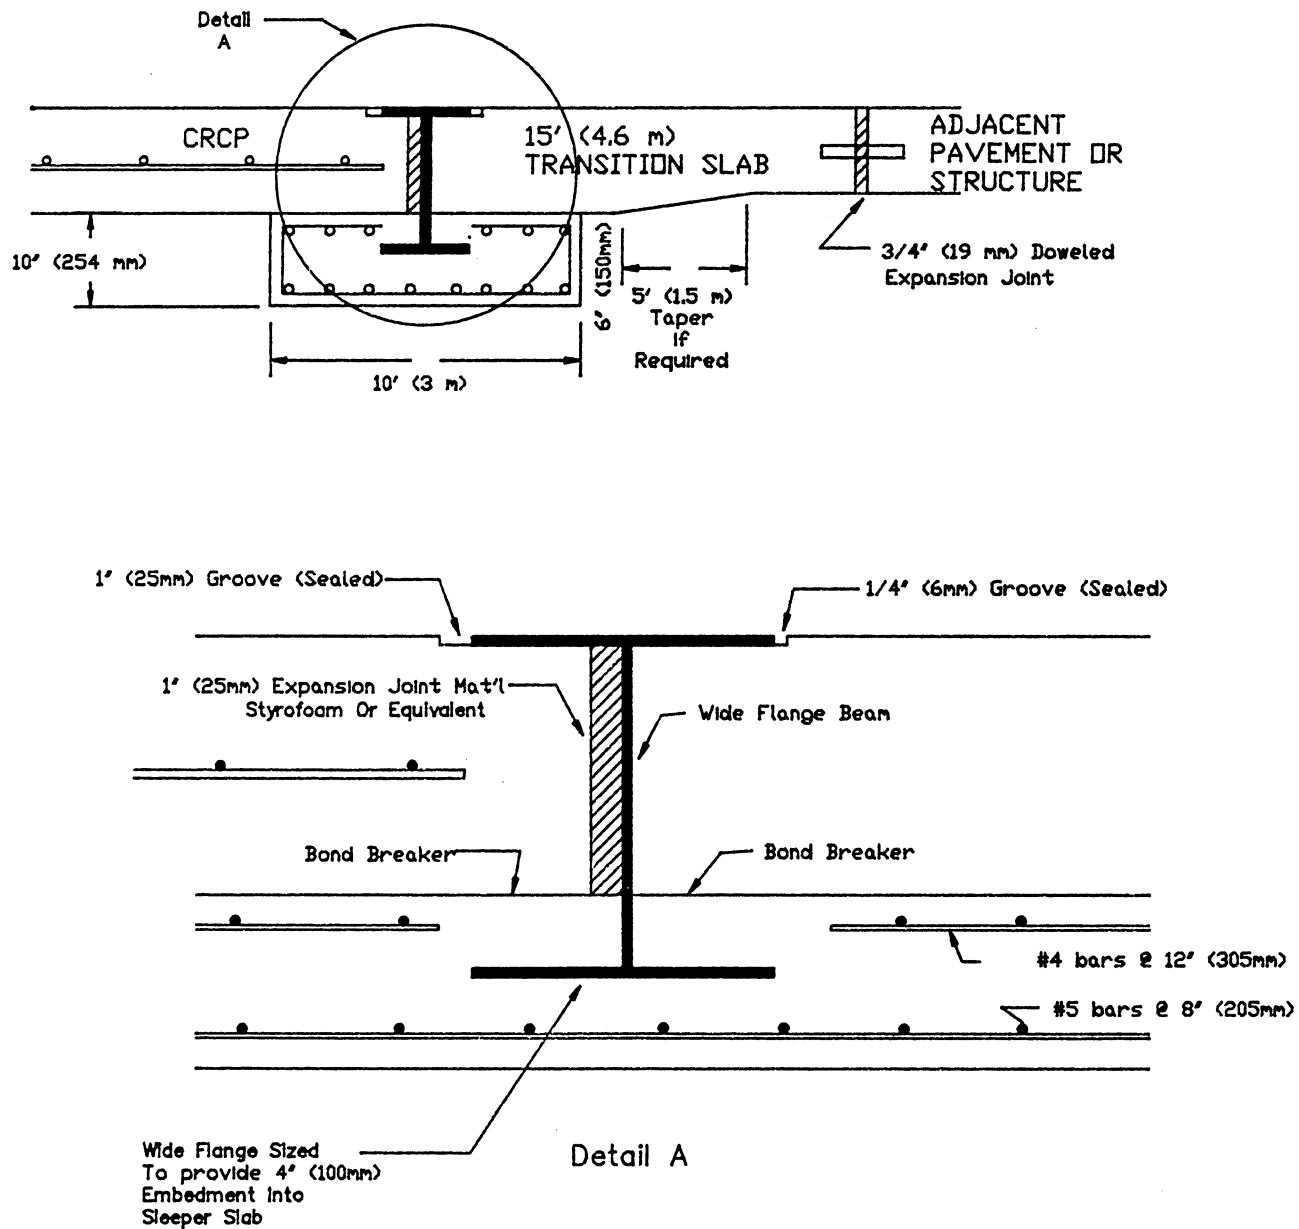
CONTINUOUSLY REINFORCED CONCRETE PAVEMENT - WIDE FLANGE BEAM TERMINAL JOINT
